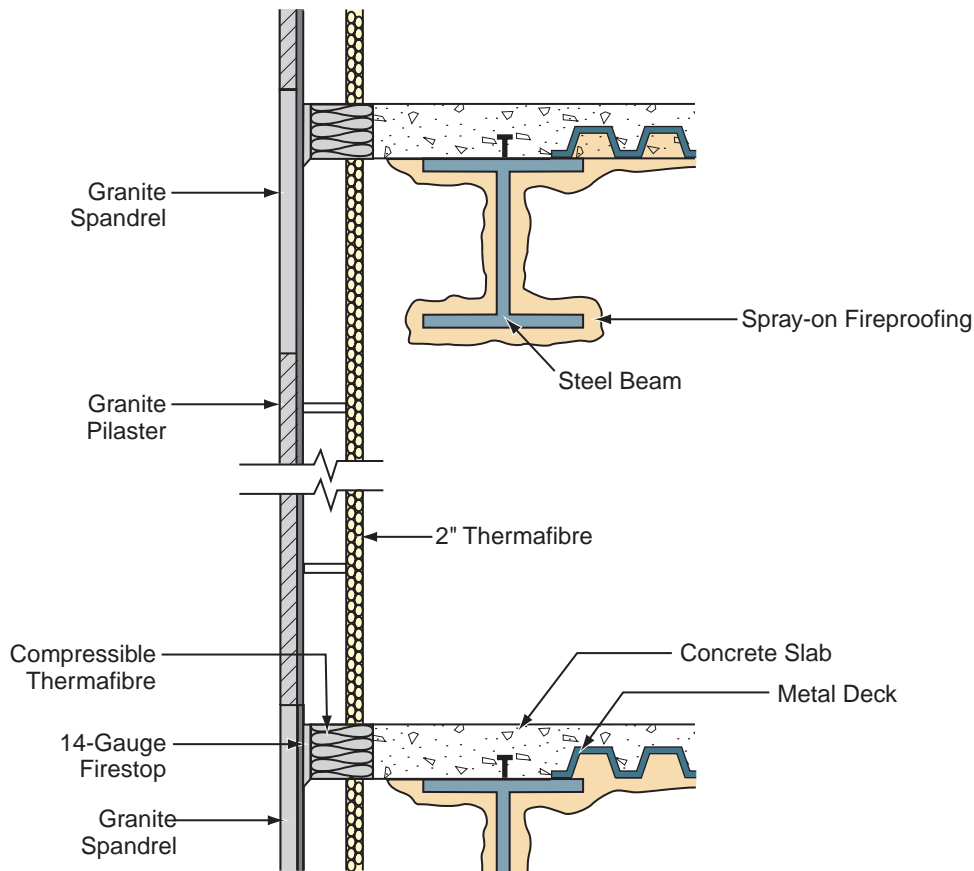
Compartmentalization provided by concrete floor slabs.
